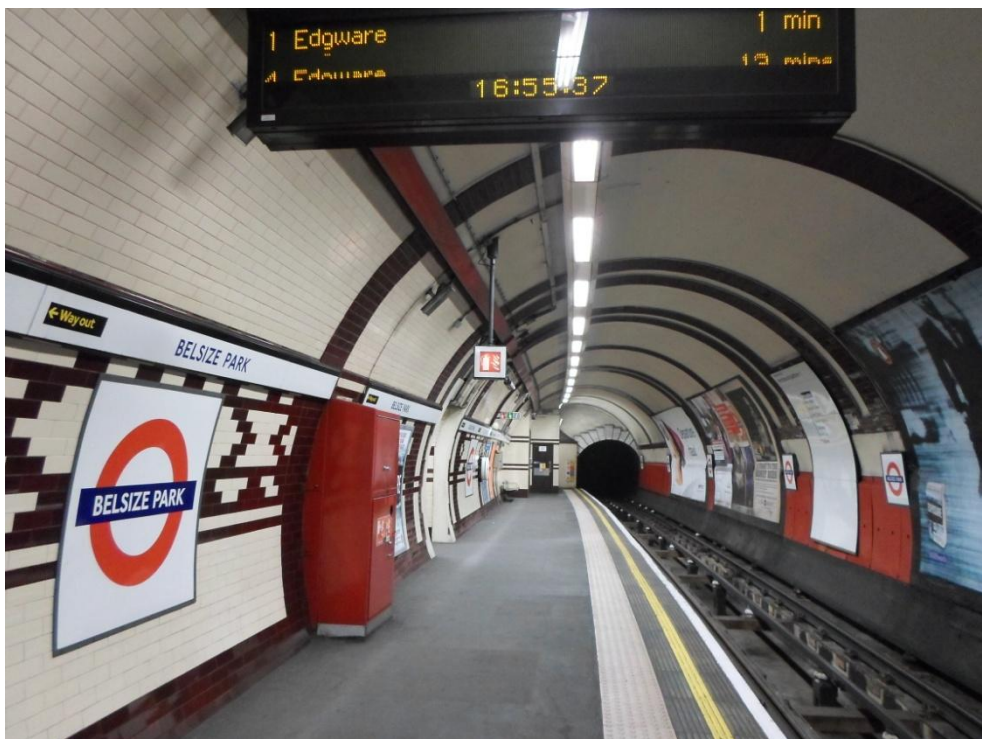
Photograph showing the existing hydrant outlet cabinet on platform 1
